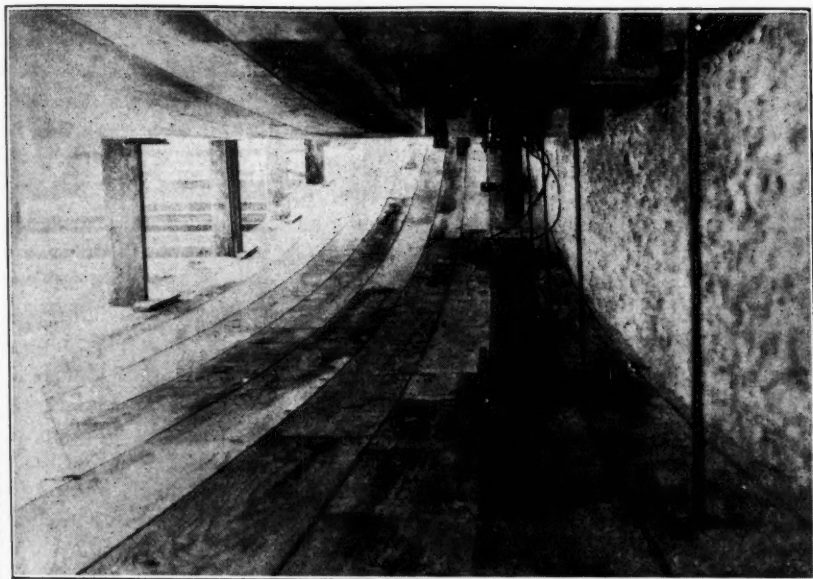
INTERIOR OF FORM READY FOR CONCRETE AT ELEVATION 40, STEVENSON CREEK TEST DAM.
